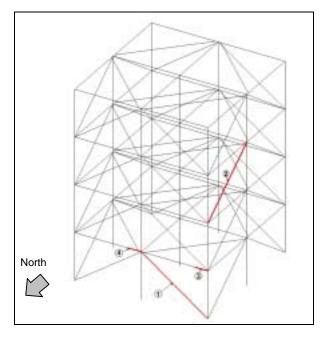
Damage introduced to the steel frame in different cases
